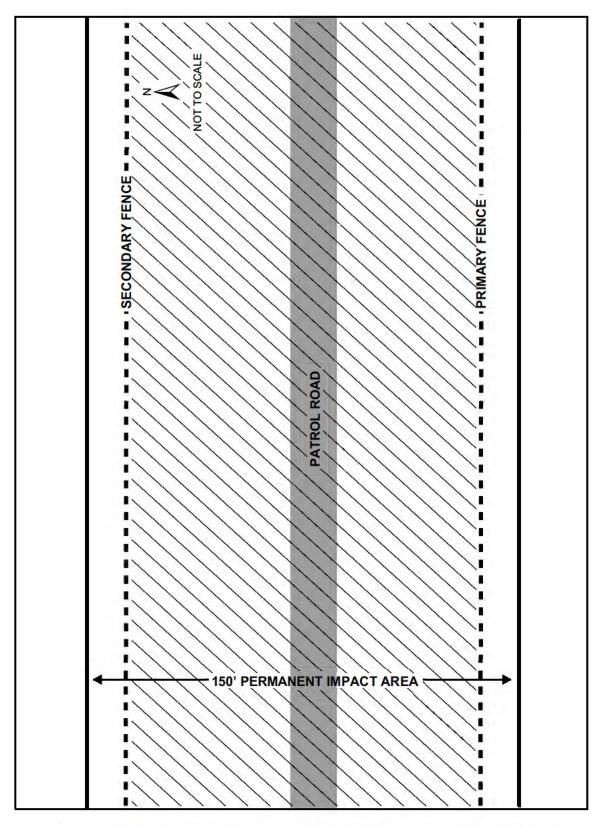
Schematic of Proposed Project Corridor – Alternative 3
